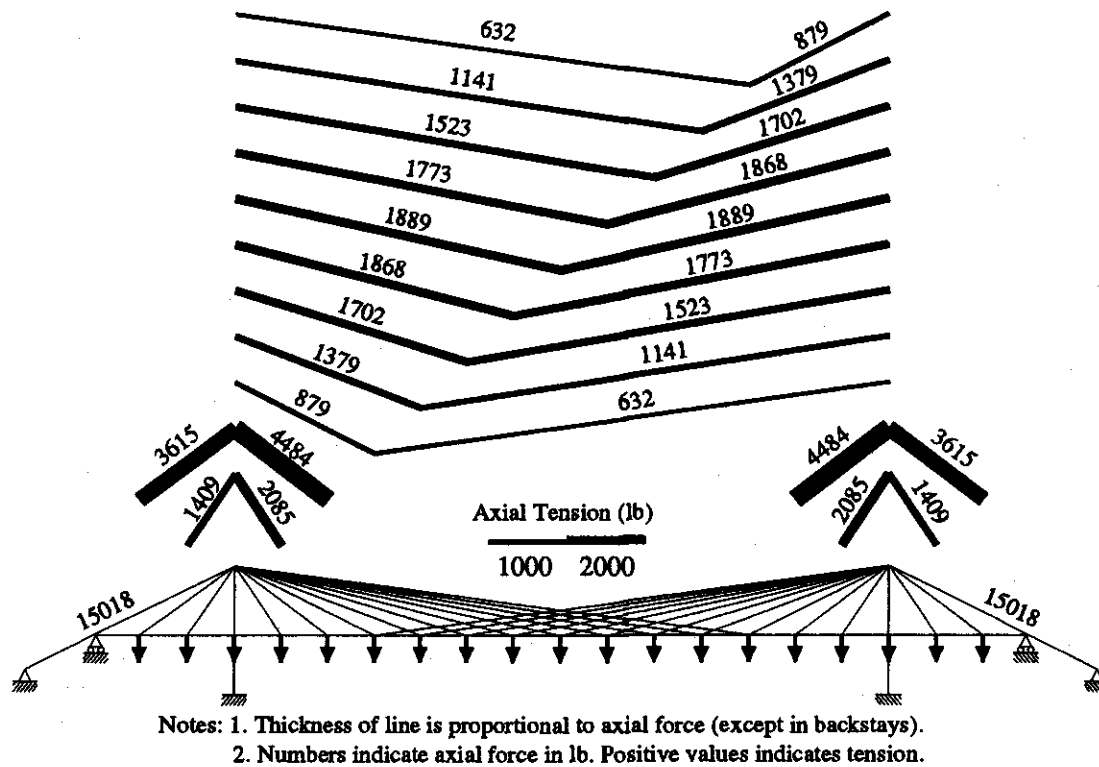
Dead Load Axial Forces in Cables of Bluff Dale-Type Bridge with Crossing Fan Cable Pattern
